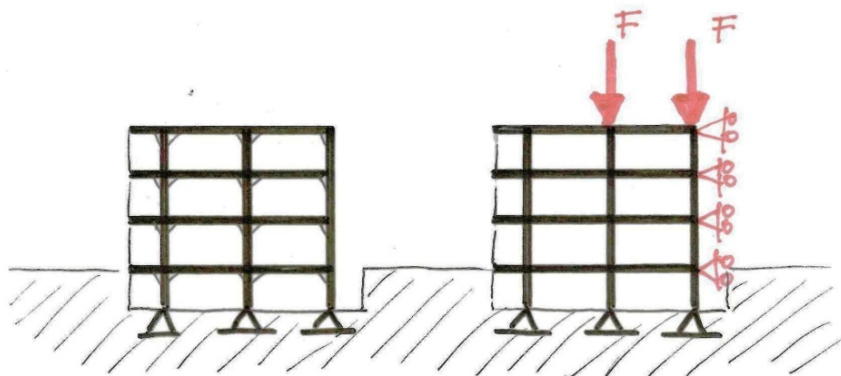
Structural stability scheme before and after (Source: Royal HaskoningDHV)
